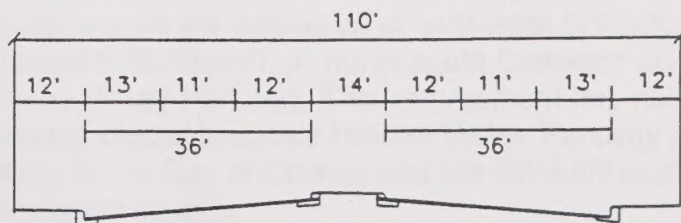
TYPICAL CROSS SECTIONS OF ROADWAYS
